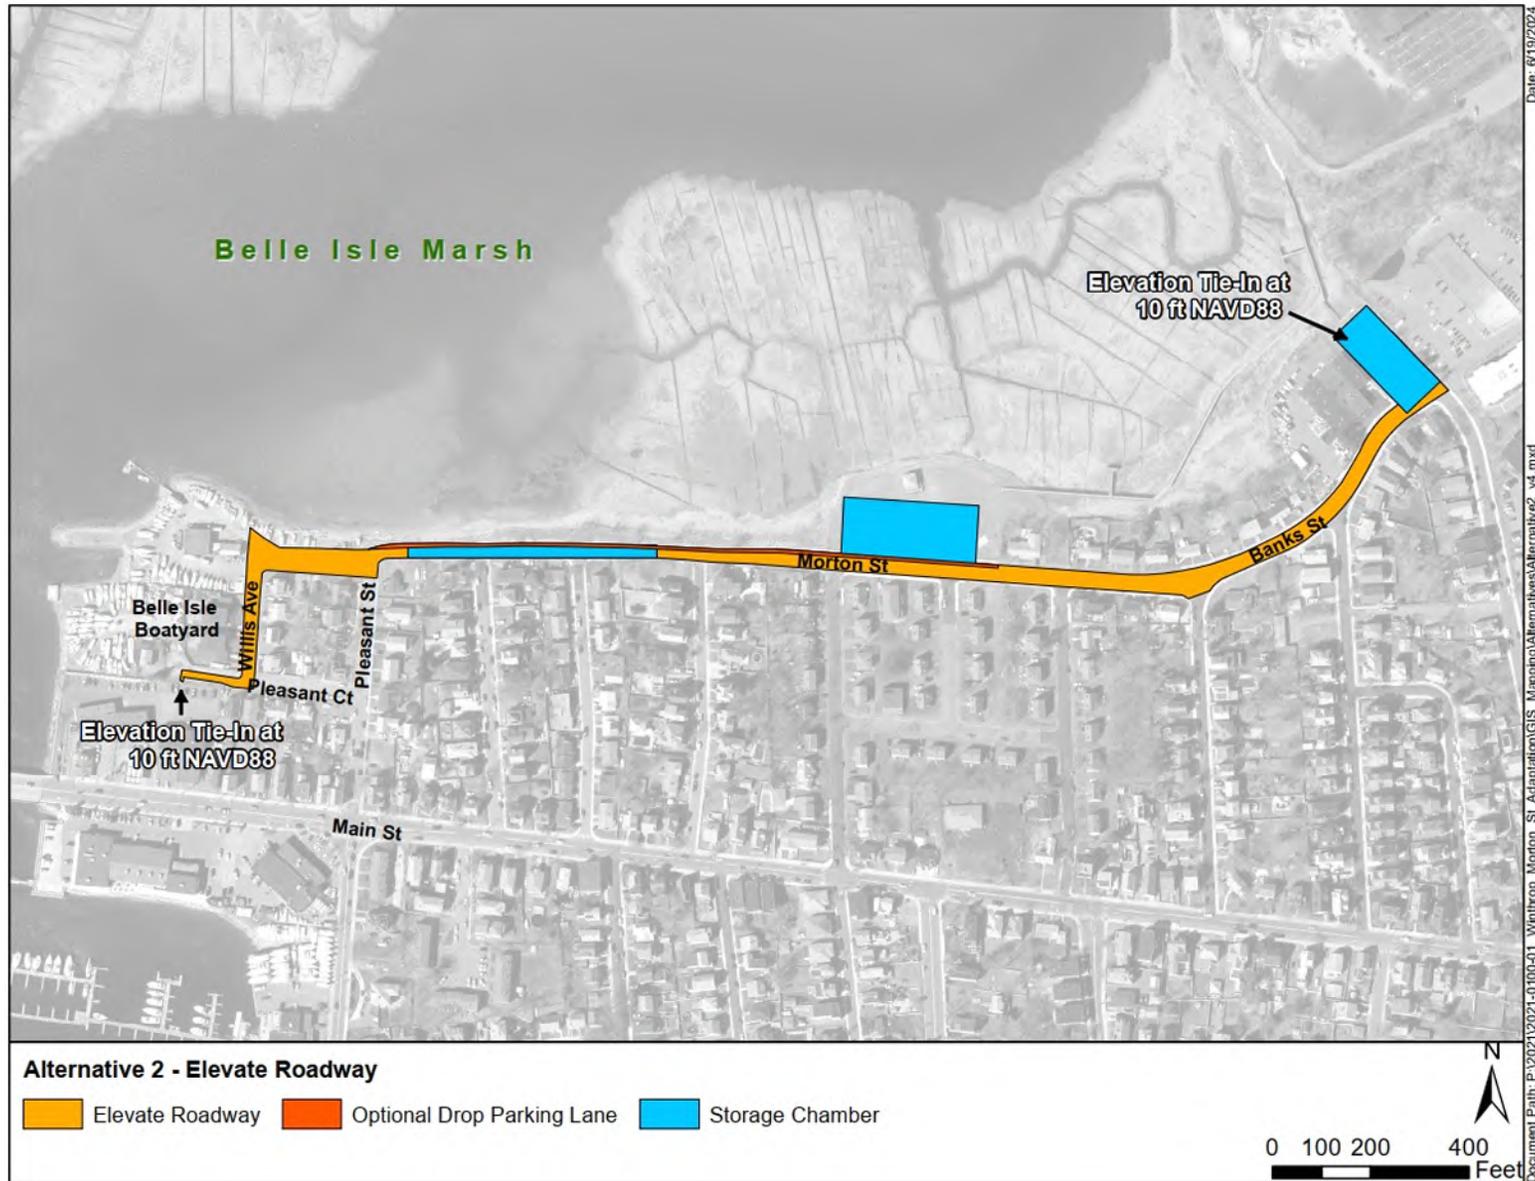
Alternative 2 – Raised Roadway (10 ft NAVD88) Conceptual Design.
